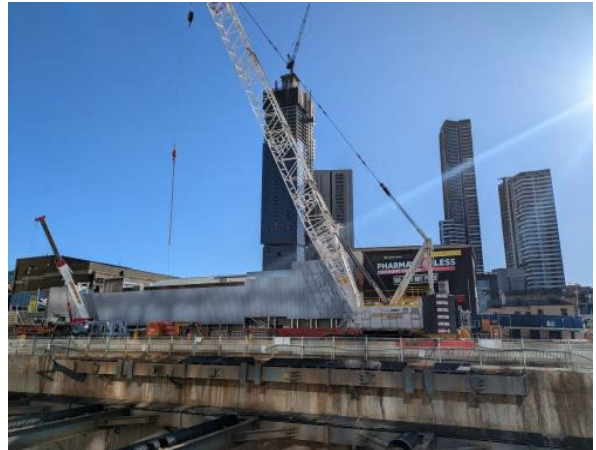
Parramatta Site: Staged container wall removal and install of steel structure ongoing.
